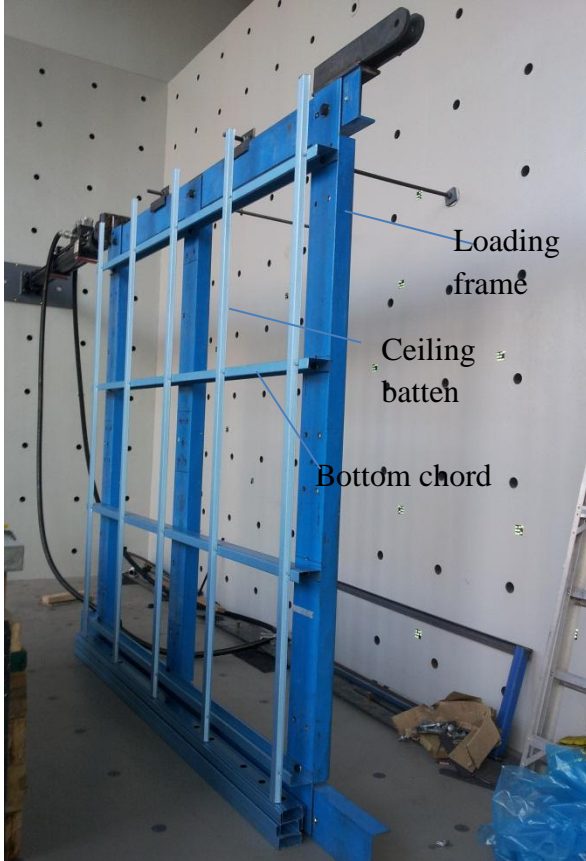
Photograph of loading frame with ceiling bottom chords and ceiling battens mounted on it.
